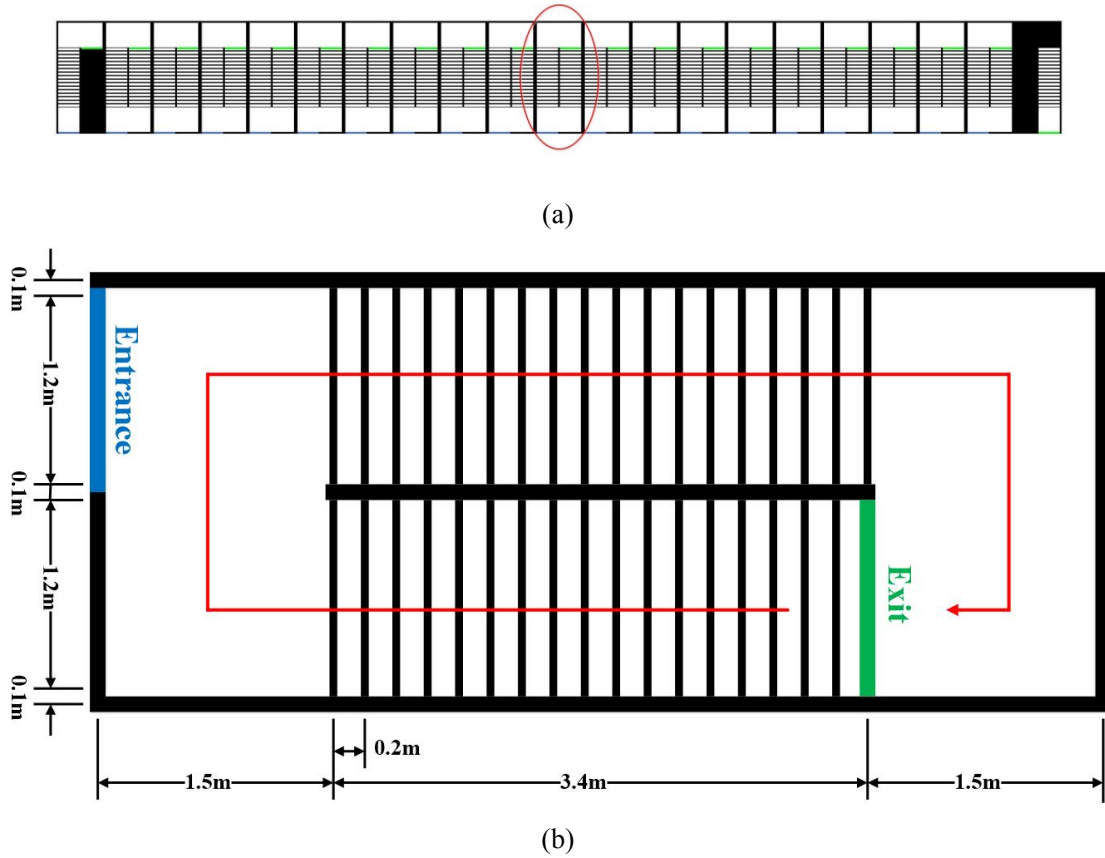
(a) the structure of the stair system, and (b) the detail of the stair connecting the 12th floor and 11th floor underground
